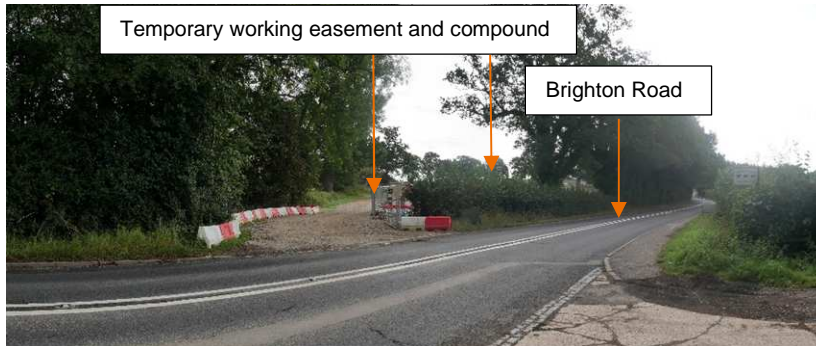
Taken from Brighton Road, looking east towards temporary construction compound and working easement.
